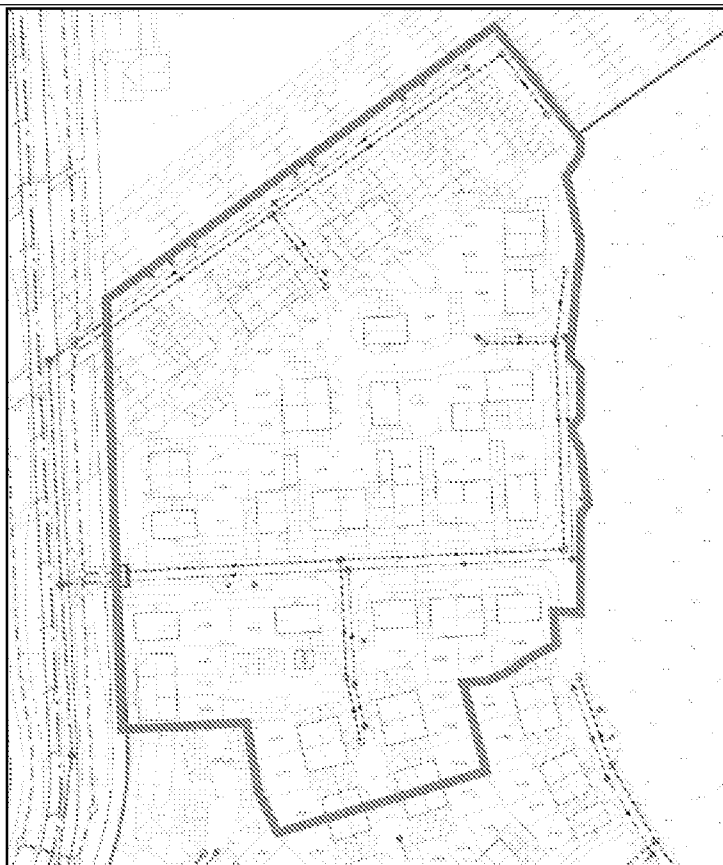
Northern section of the parcel shown as draining to the road on Drainage Layout 1.
